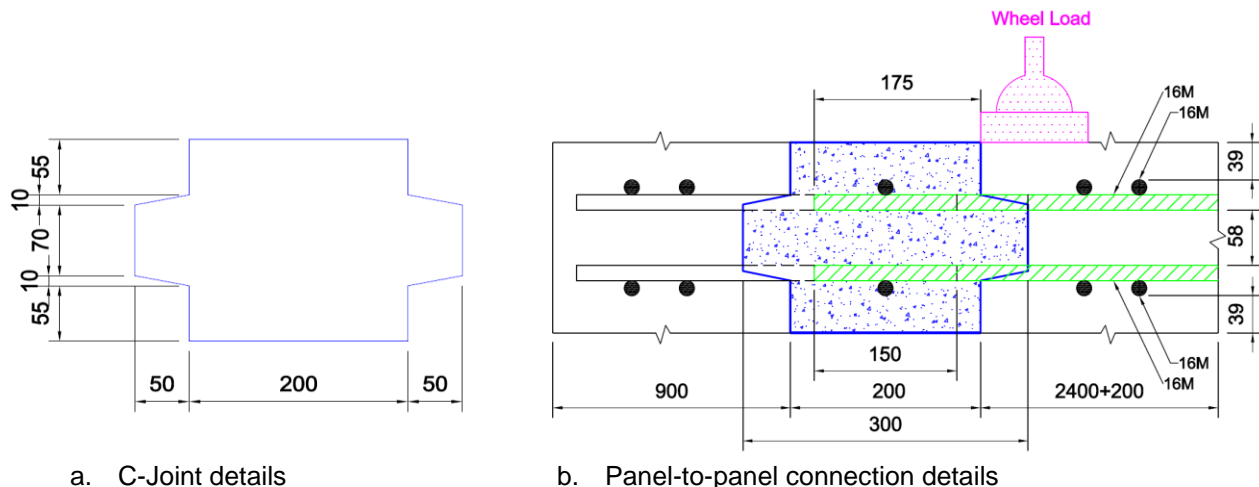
depicts the C-shape panel-to-panel connection with vertical female-to-female shear key. The clear joint width between the ends of the jointed panels is 200 mm. So a projecting GFRP bar from the end of one panel will project into the joint with a length of 175 mm. The pullout strength of the embedded GFRP in the joint will be resisted by the bond between its surface and the surrounding UHPFRC. The slope of the inner side of the shear key has a slope of 1vertical to 5 horizontal. The vertical shear key is expected to provide vertical shear friction resistance between the precast concrete and the UHPFRC filling to allow for vertical shear continuity of the slab across the joint.
